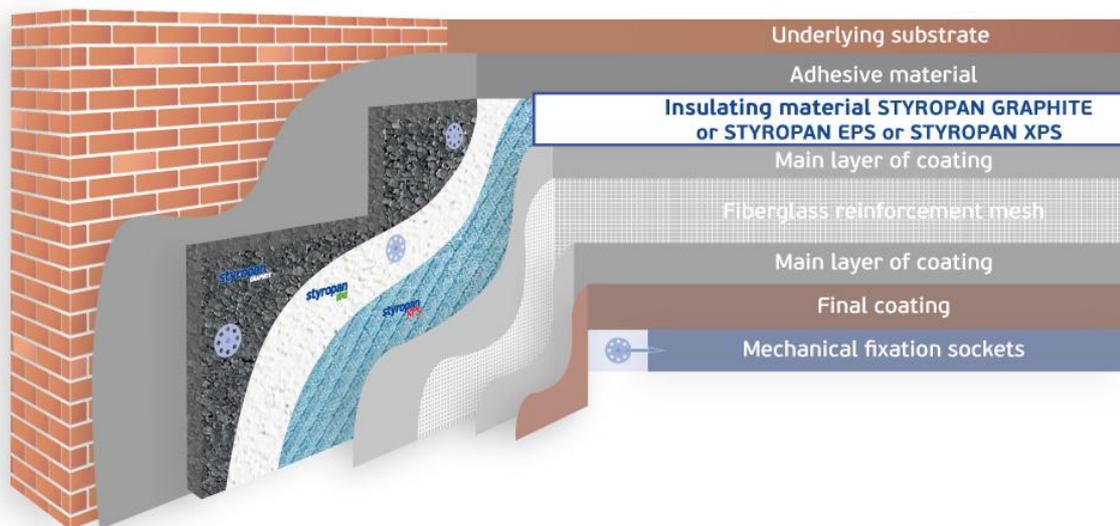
External wall thermal insulation ETICS by Styropan (www.styropan.gr)
